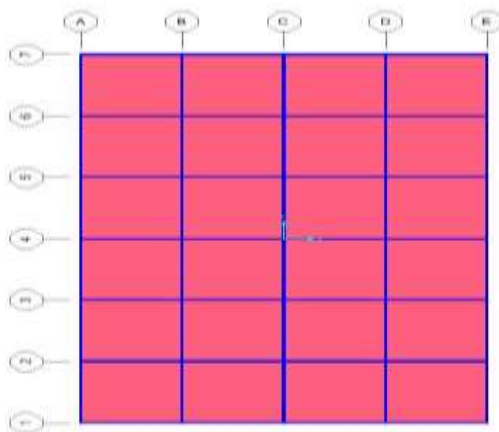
Plan of G+20 multistoried Steel Building in SAP2000
